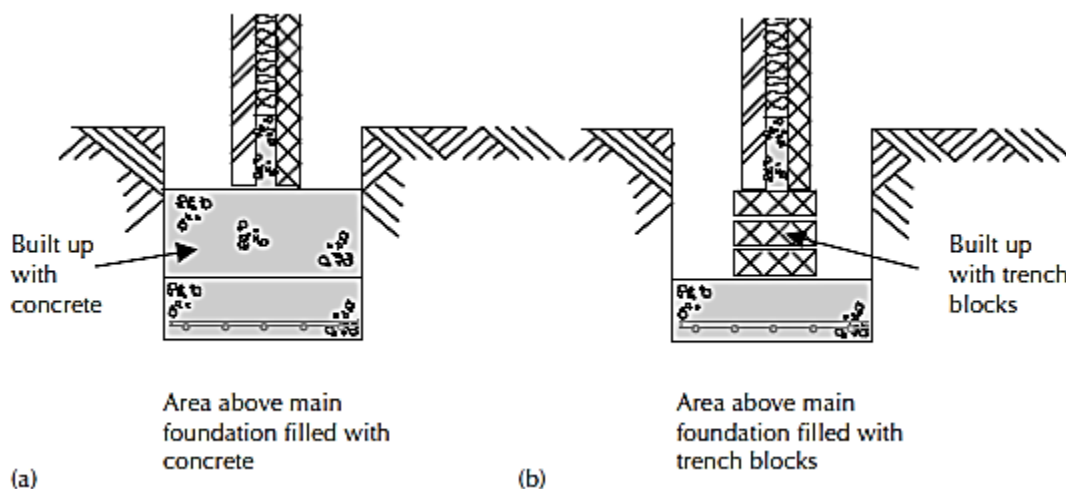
(a and b) Use of trench fill and trench blocks in strip foundations.
